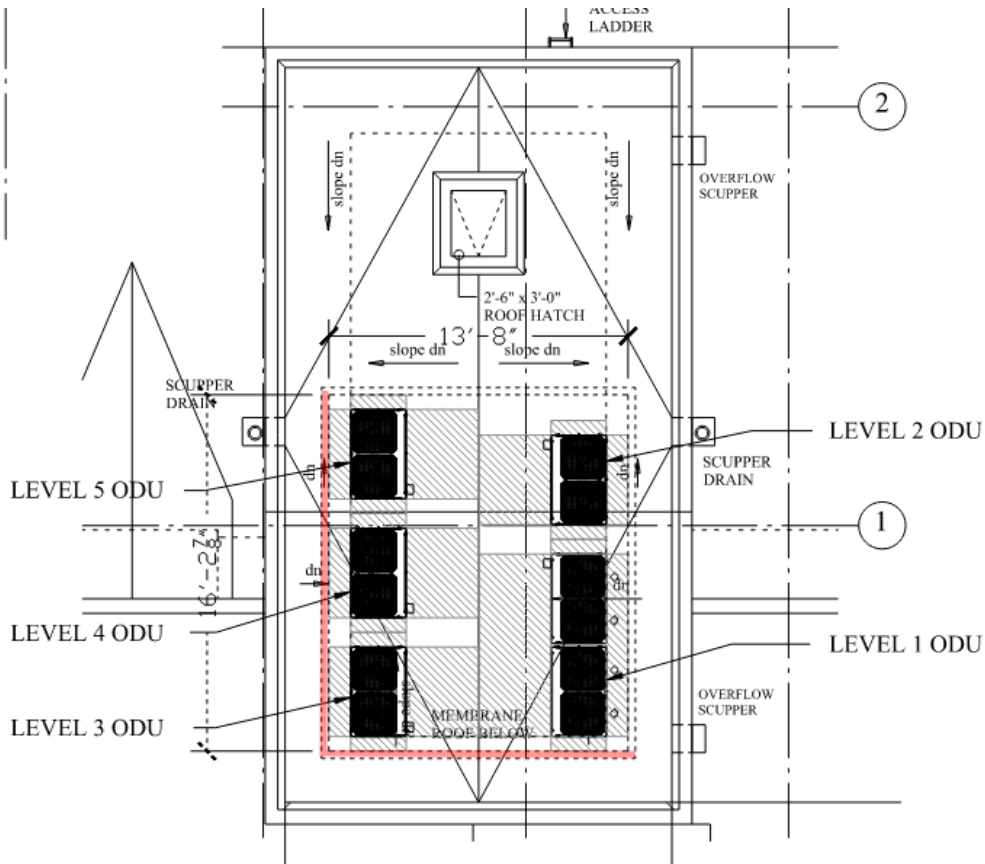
VRV Units and Screening on Rooftop of Existing 2005 Building
